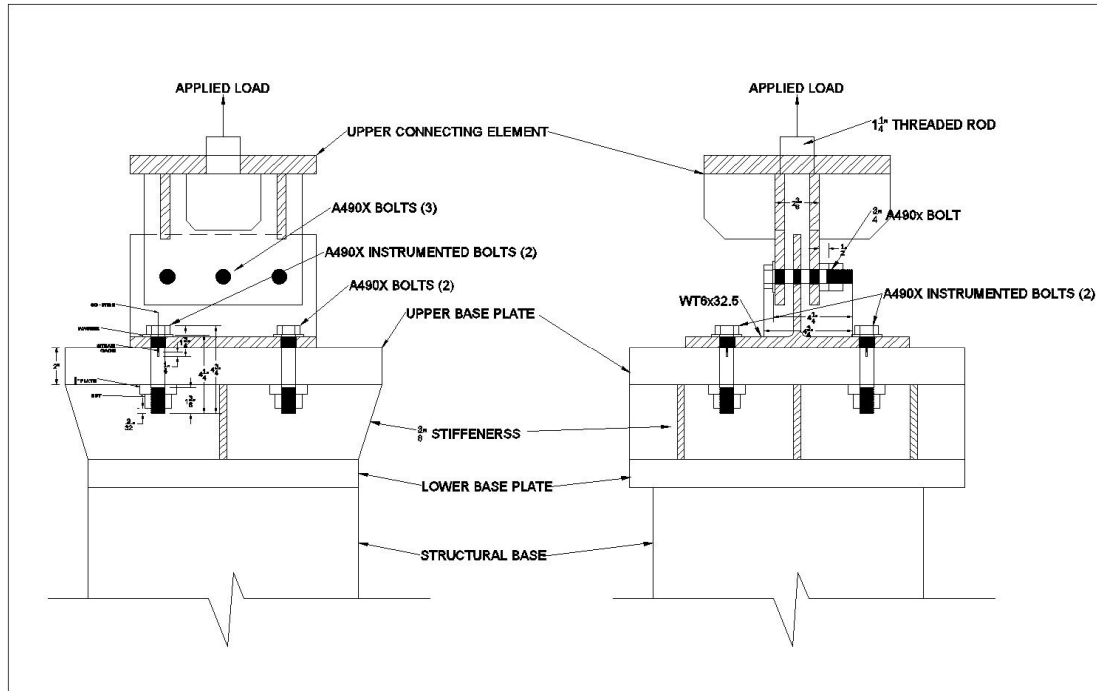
Fully Bolted WT6x32.5 Specimen.
